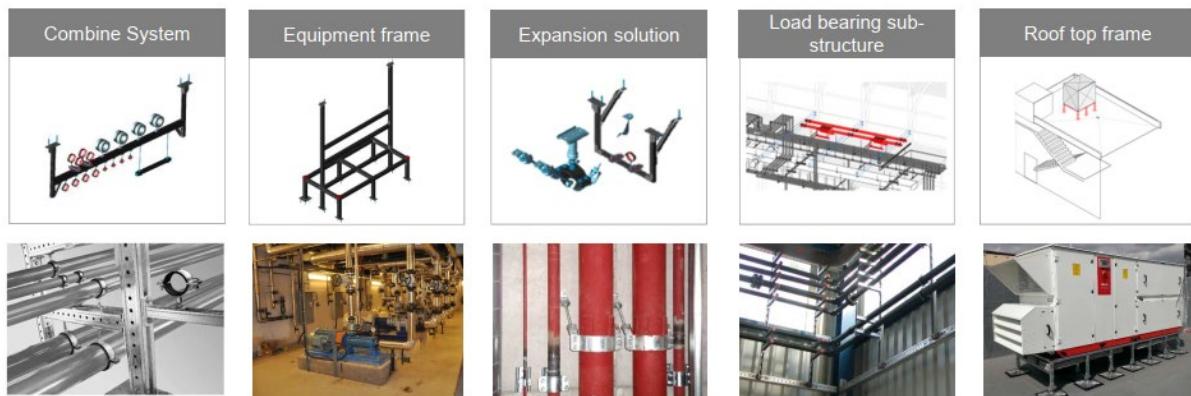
Examples of MEP modular installation support systems (Courtesy of Hilti)
